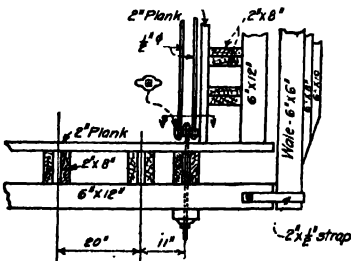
Detail of retaining wall forms—Grand Central Terminal, New York.
